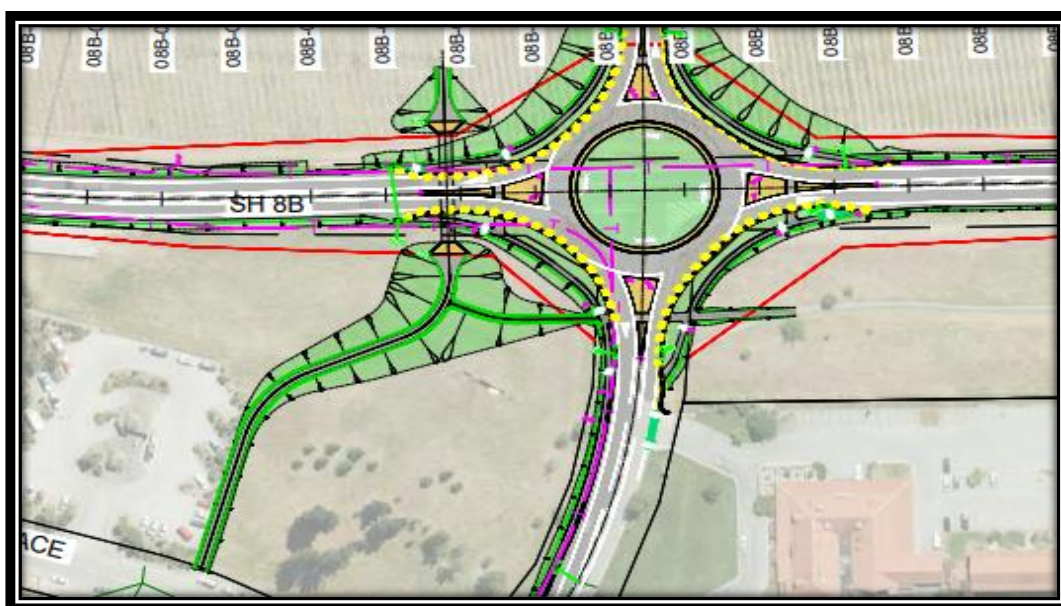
Plan of the New Roundabout, Footpaths, and Underpass.
